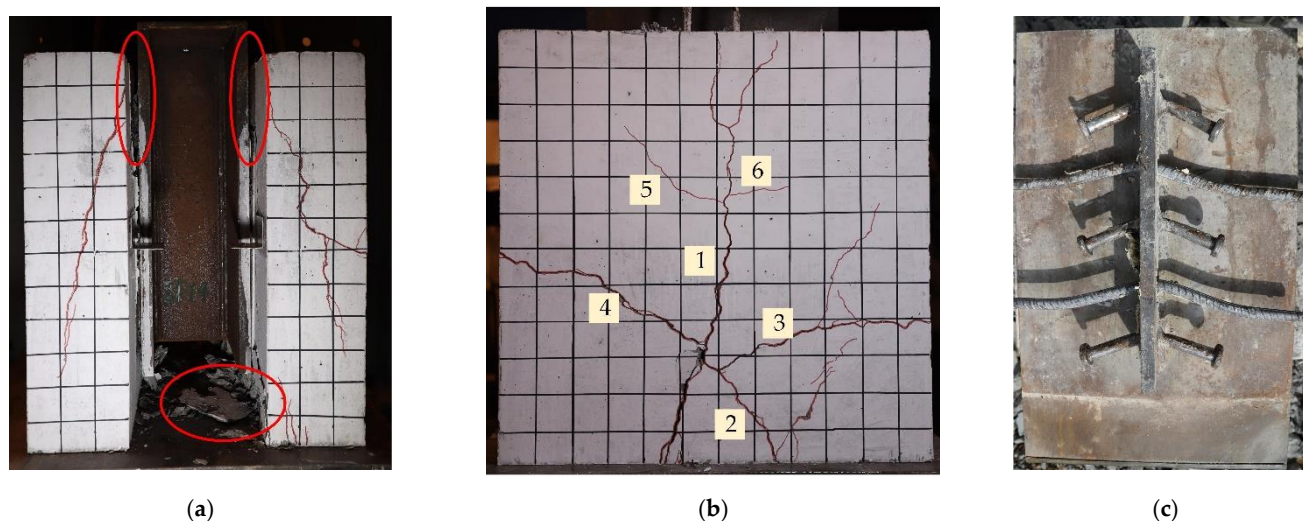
Failure modes of composite connectors with end-bearing concrete: (a) front of concrete slab; (b) side of concrete slab; (c) perforated steel plate.
